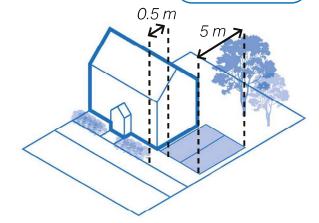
Illustrative diagram showing the indicative layout of and minimum dimensions of on-plot side parking
